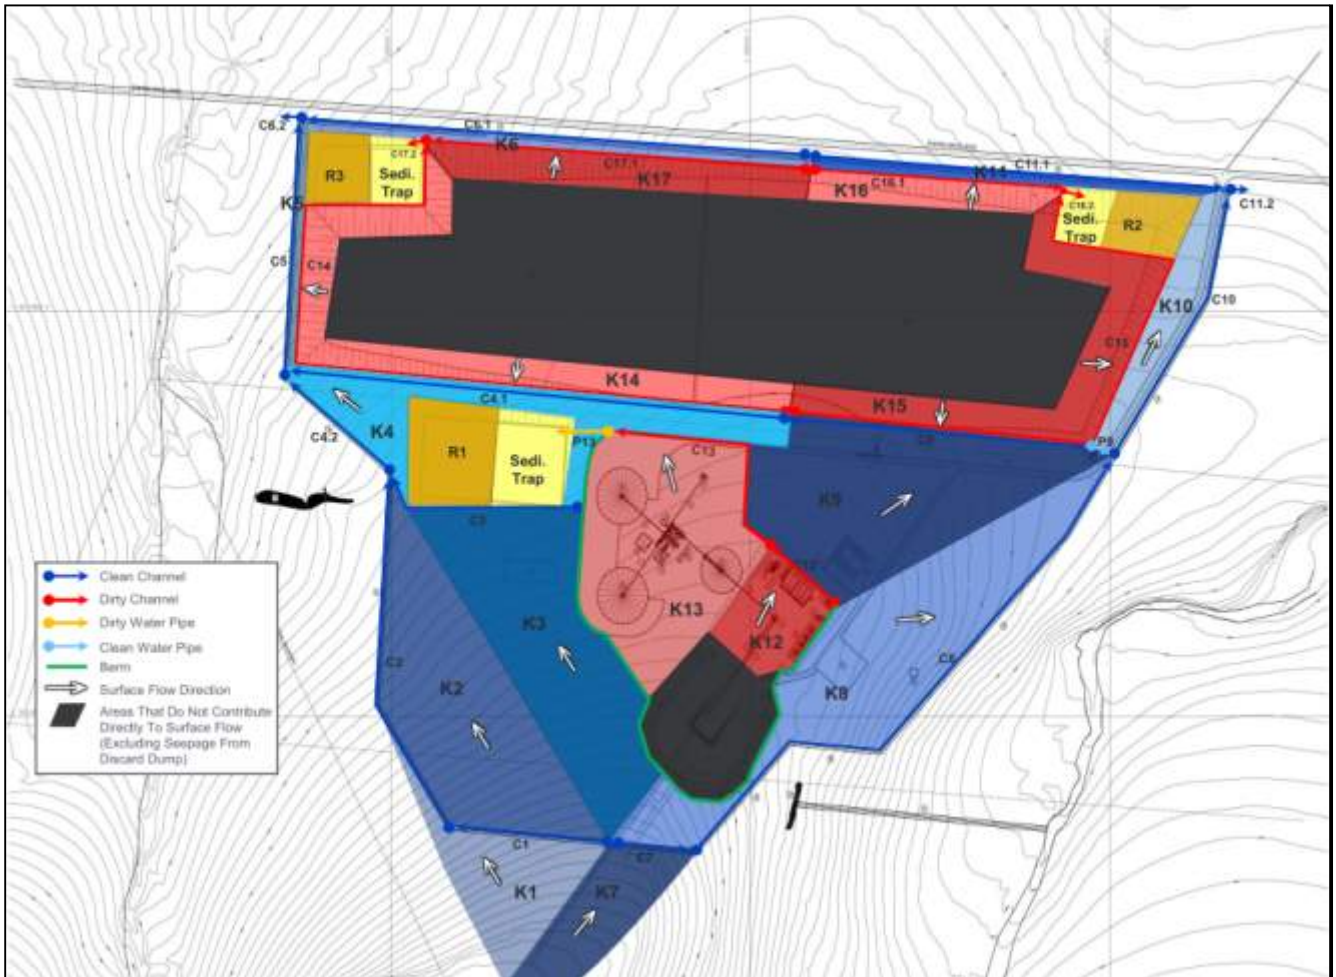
Conceptual Stormwater Management Plan (WSP, 2013)
